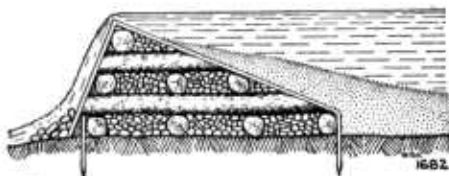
Crib dam. For heads not exceeding 6 feet, timbers, placed across one another at intervals of 2 or 3 feet and spiked together, provide substantial construction
